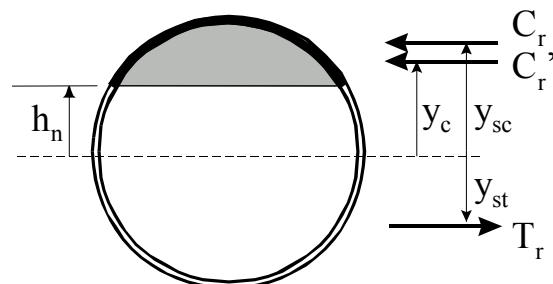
Flexure of concrete-filled pipe; shaded area is concrete in compression above the neutral axis.
